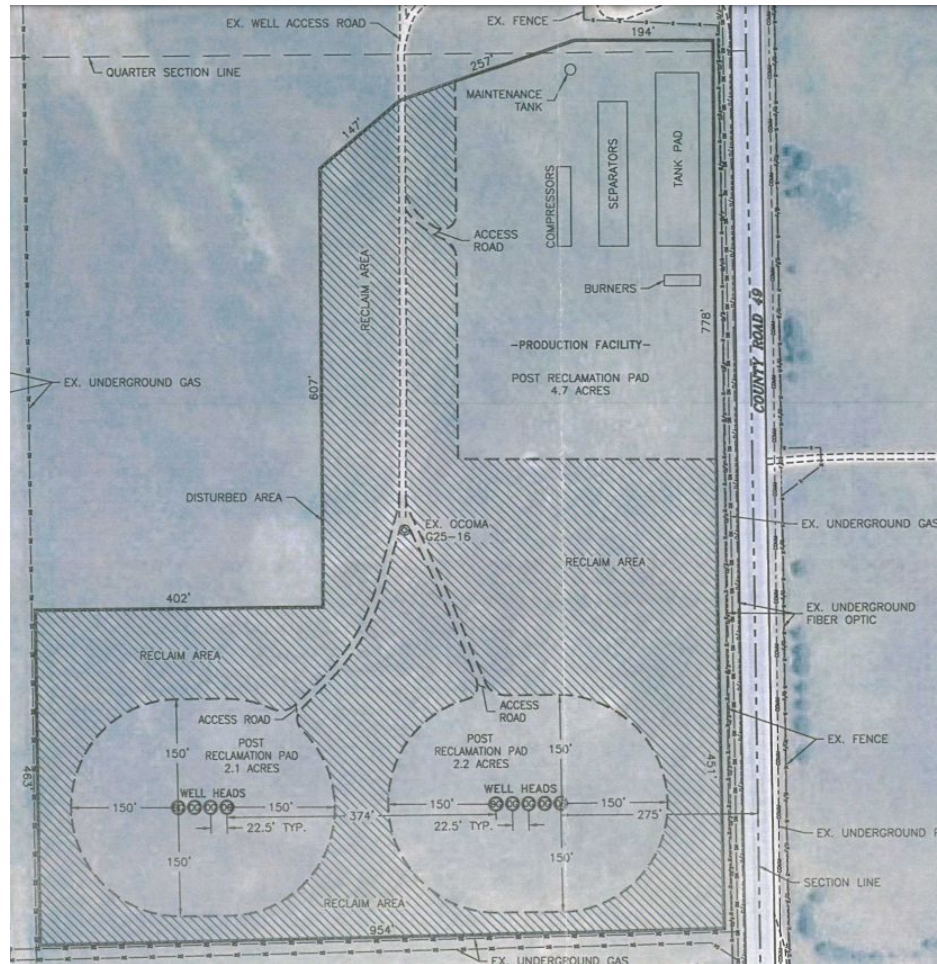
The photo was used from Doc. #400591390 to show the original location drawings.
